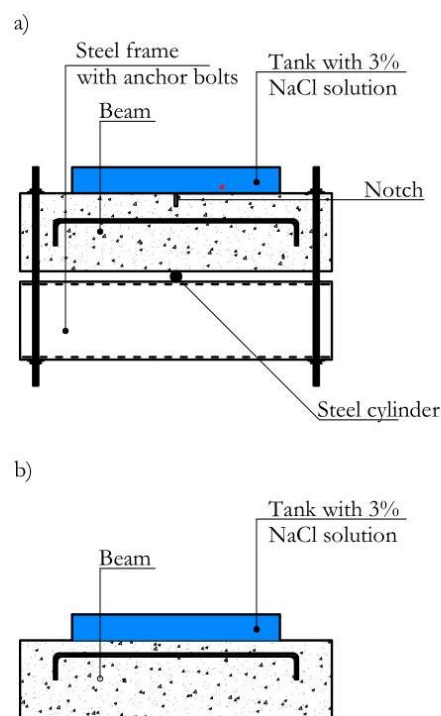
Beams exposed to a chloride solution a) cracked and under sustained loads b) uncracked and not loaded
